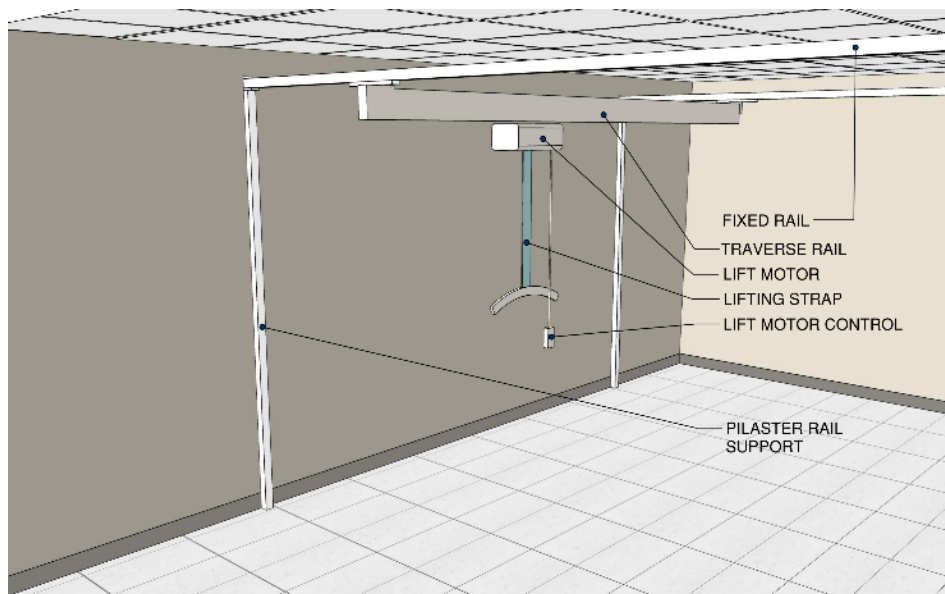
The above illustration represents a wall-mounted system with pilaster upright supports. Note that this system can also be used in combination with a direct wall fixed rail support.
